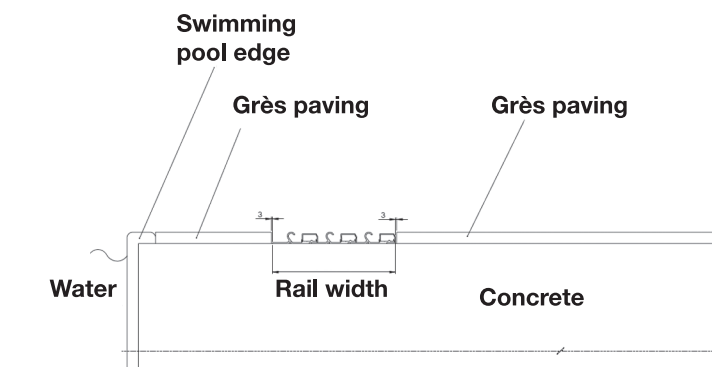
, example of the laying of a terrace terminating under the hem of the swimming pool, the rail is installed flush with the paving.
